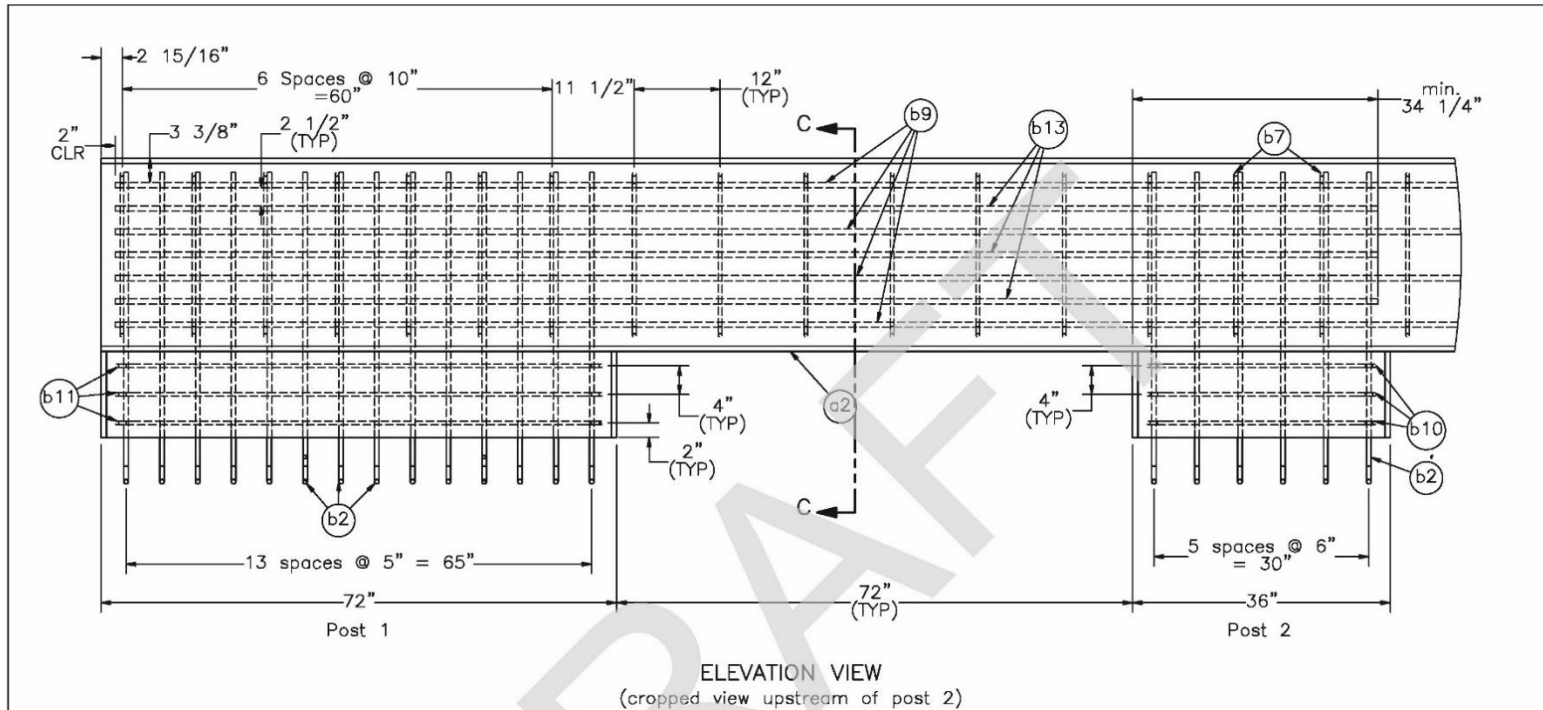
Open Concrete Bridge Rail Deck and Grade Beam Assembly, Interior Section
